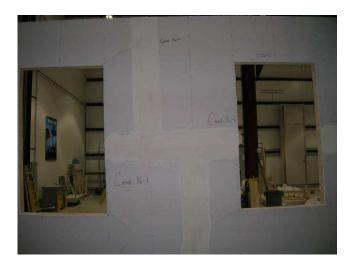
Configuration 17 (Gypsum at braced wall panel)
